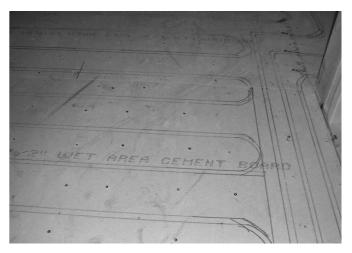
Mark pipe locations before securing underlayment over RAUPANEL to subfloor (if required)
